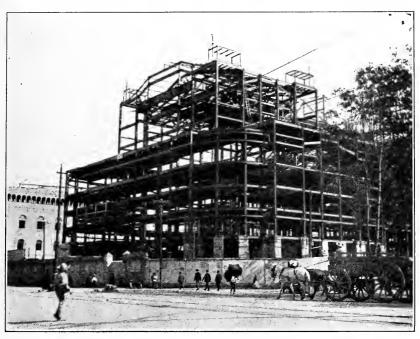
Steel skeleton structure of the National Theater in the City of Mexico. Note the heavy sections used.
